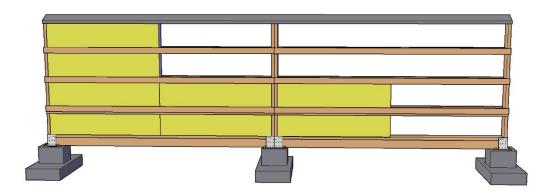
3D drawing of Hempcrete Noise barrier wall. Front view.
